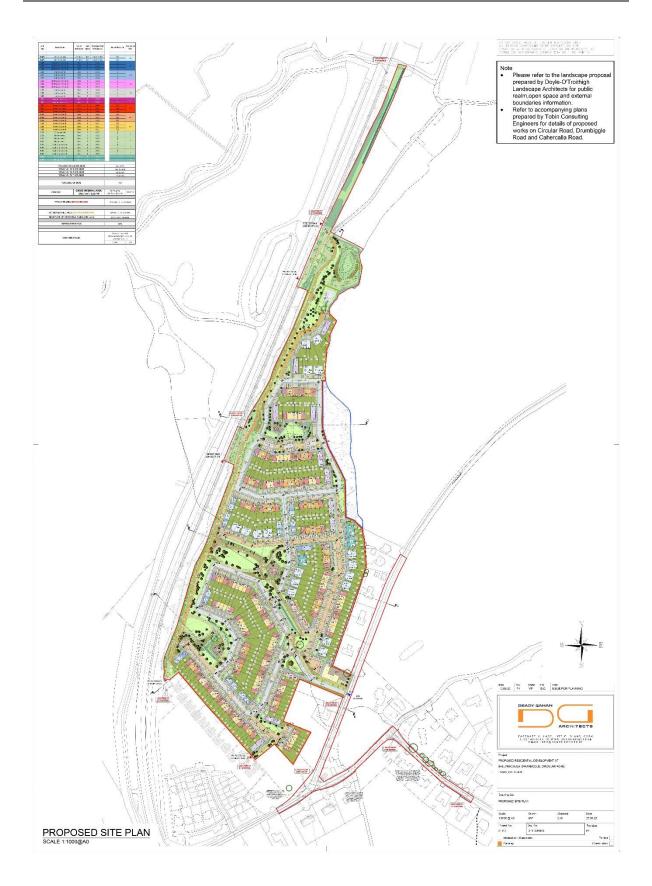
PROPOSED SITE LAYOUT (DG ARCHITECTS, 2022).
